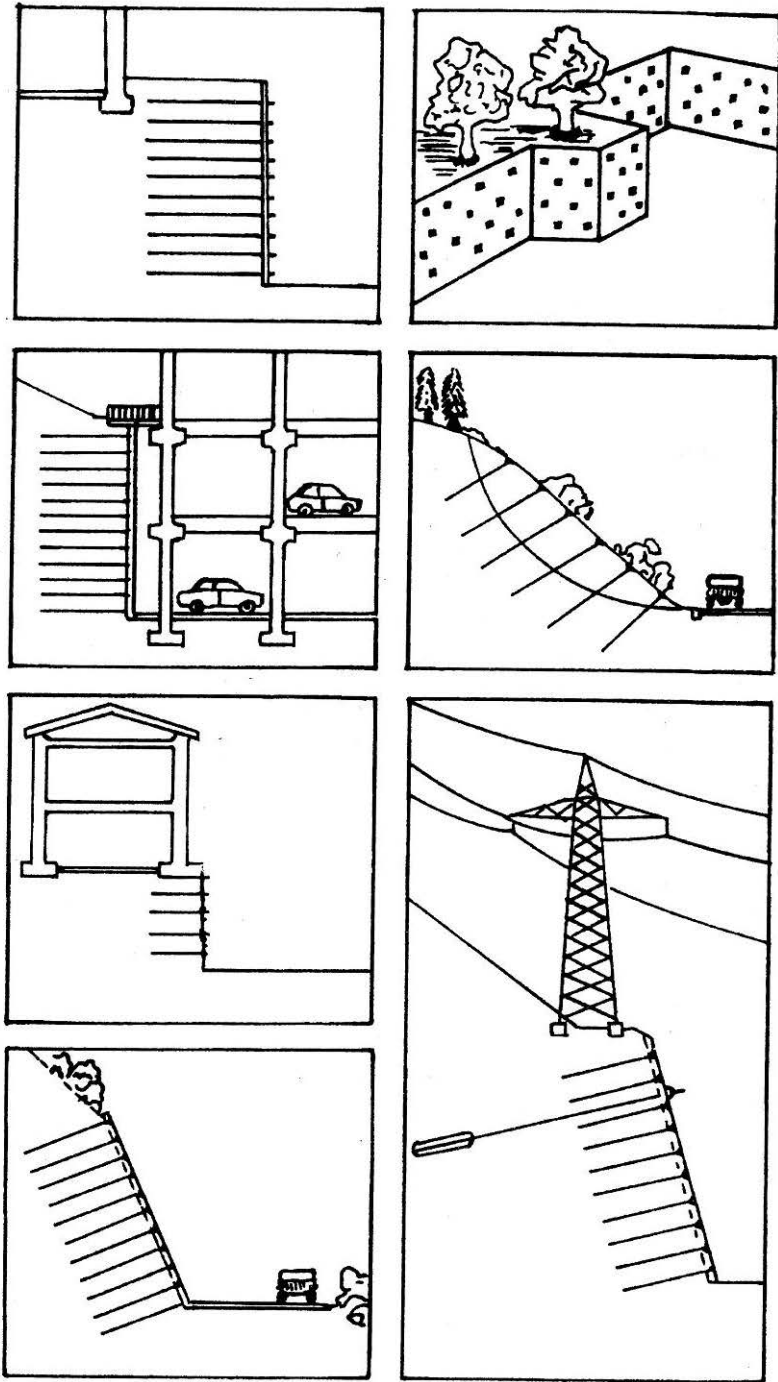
Examples of Soil Nailing Applications (The BAUER System Schrobhausen)
